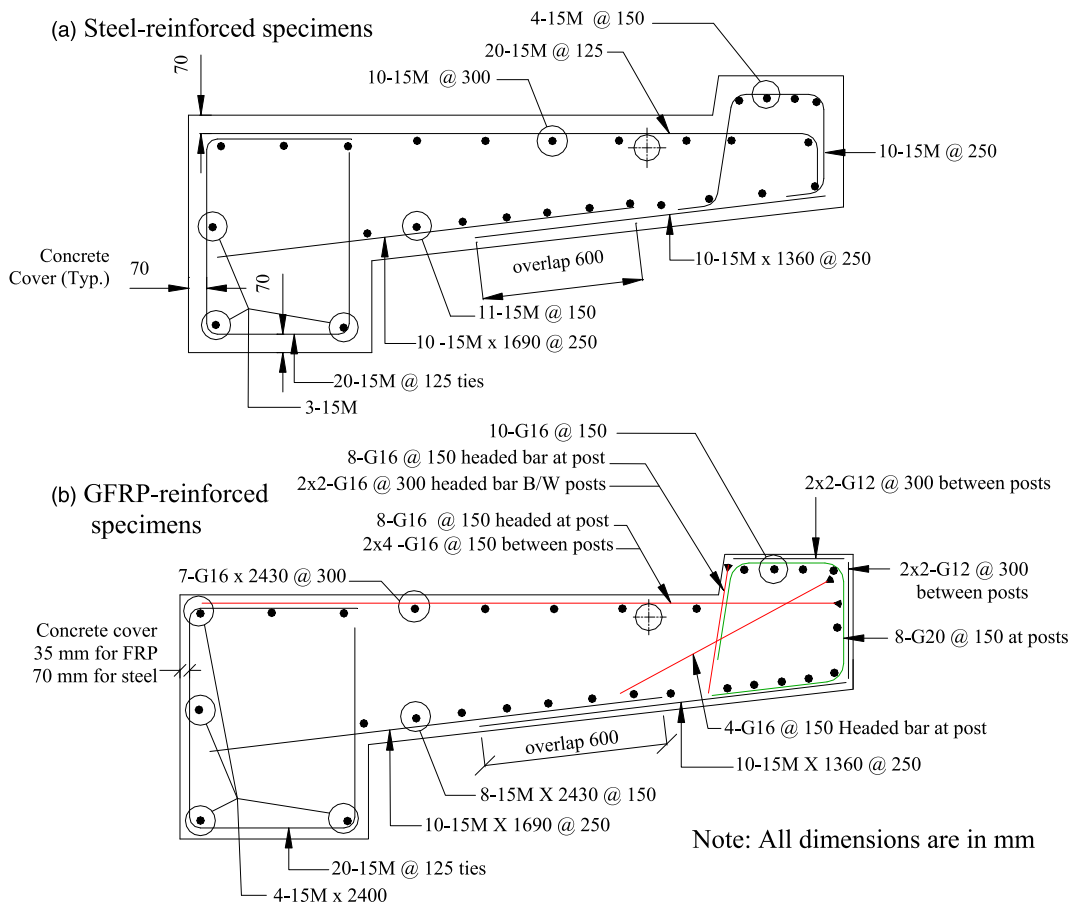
Detailing of reinforcement: (a) steel-reinforced specimens; (b) GFRP-reinforced specimens
